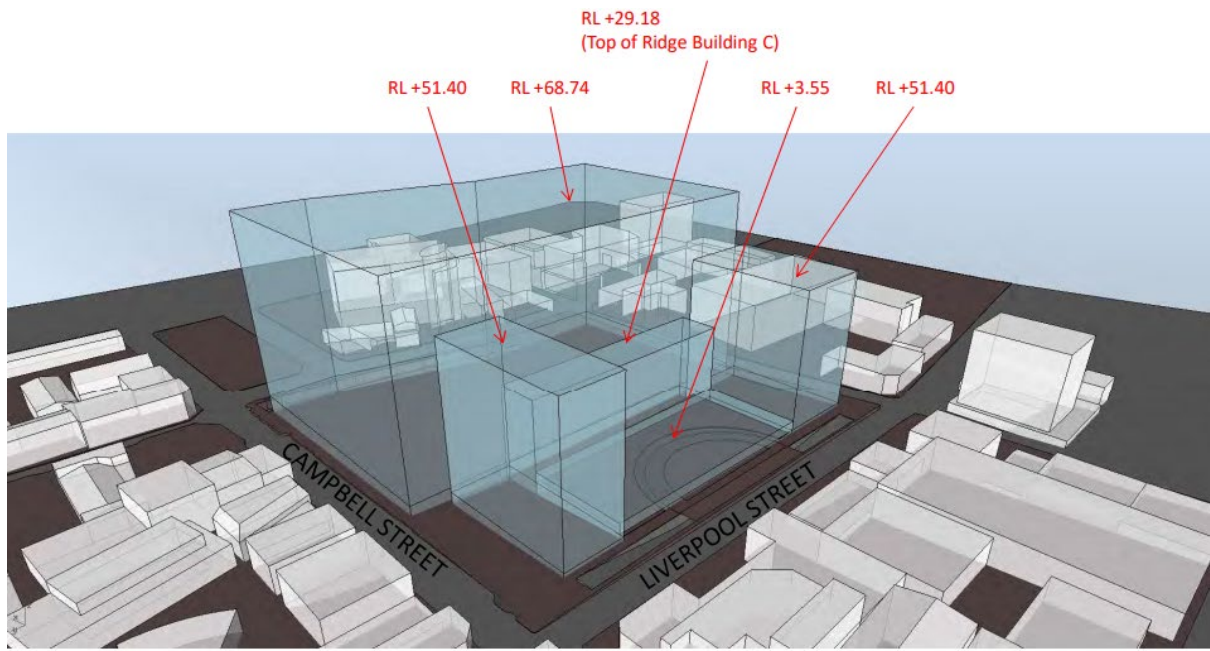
Building Envelope - three dimensional view 3
